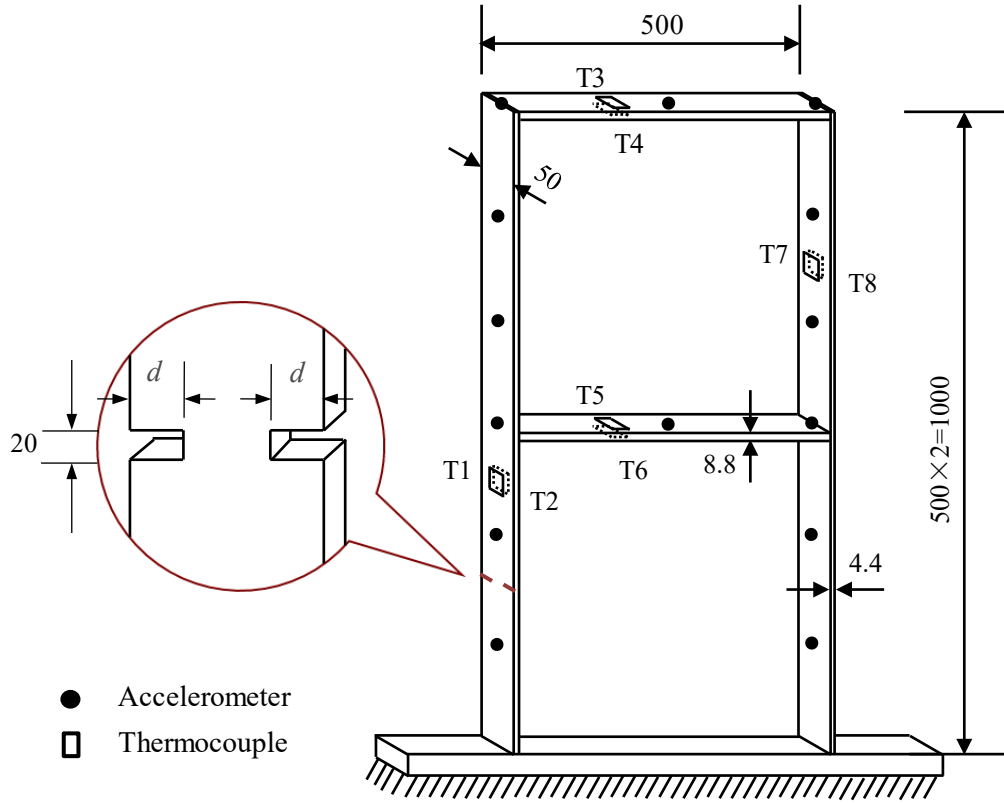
Geometric configuration of the frame structure (unit: mm)
